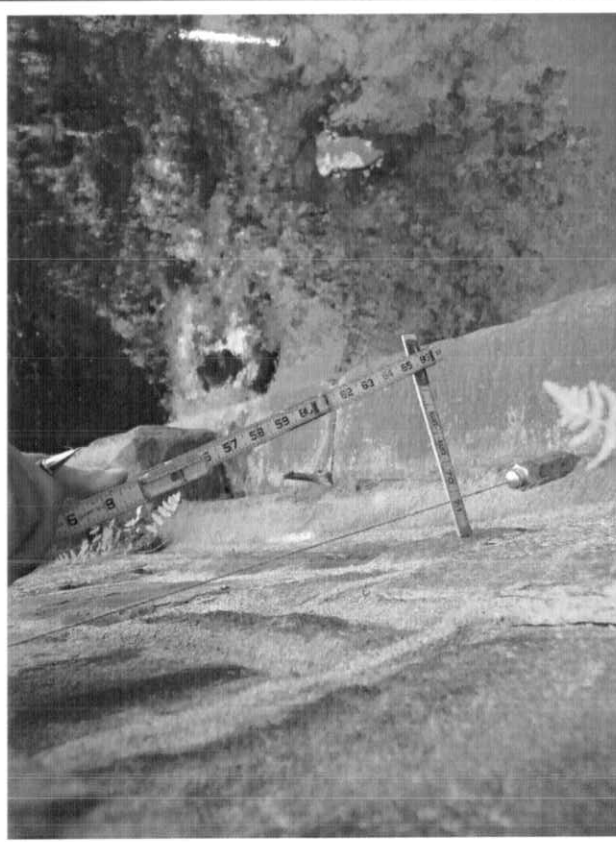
Bridge overlay ramps up approximately 3" near the base of the north parapet.
